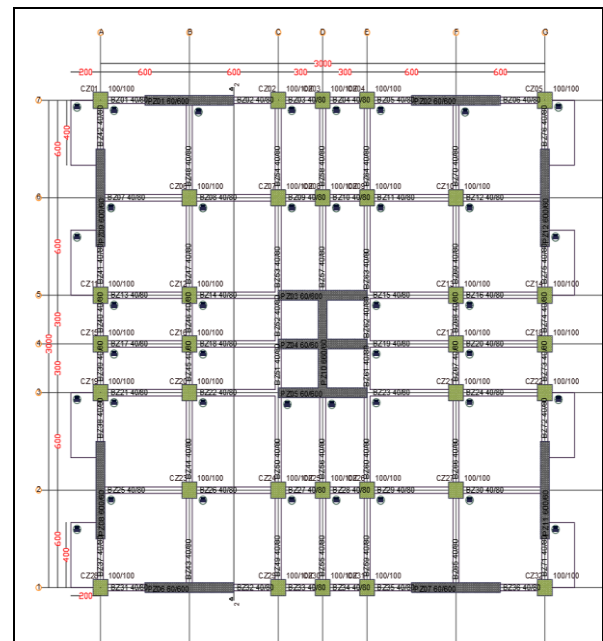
Typical floor plan of the building without support braced system (Model 1) (Units are cm).
